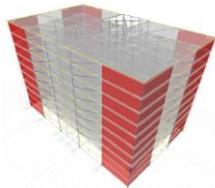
Model 3: 3D view of Flat slab structure with shear wall provided at corner
